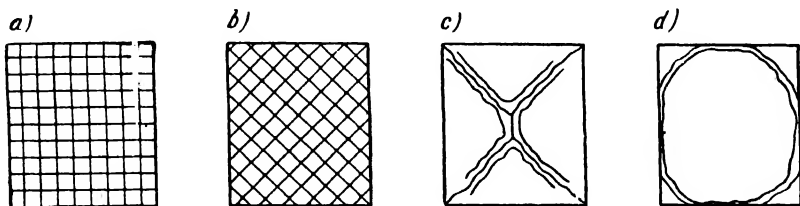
Schematic layouts of two-way slab reinforcement, and types of failure
